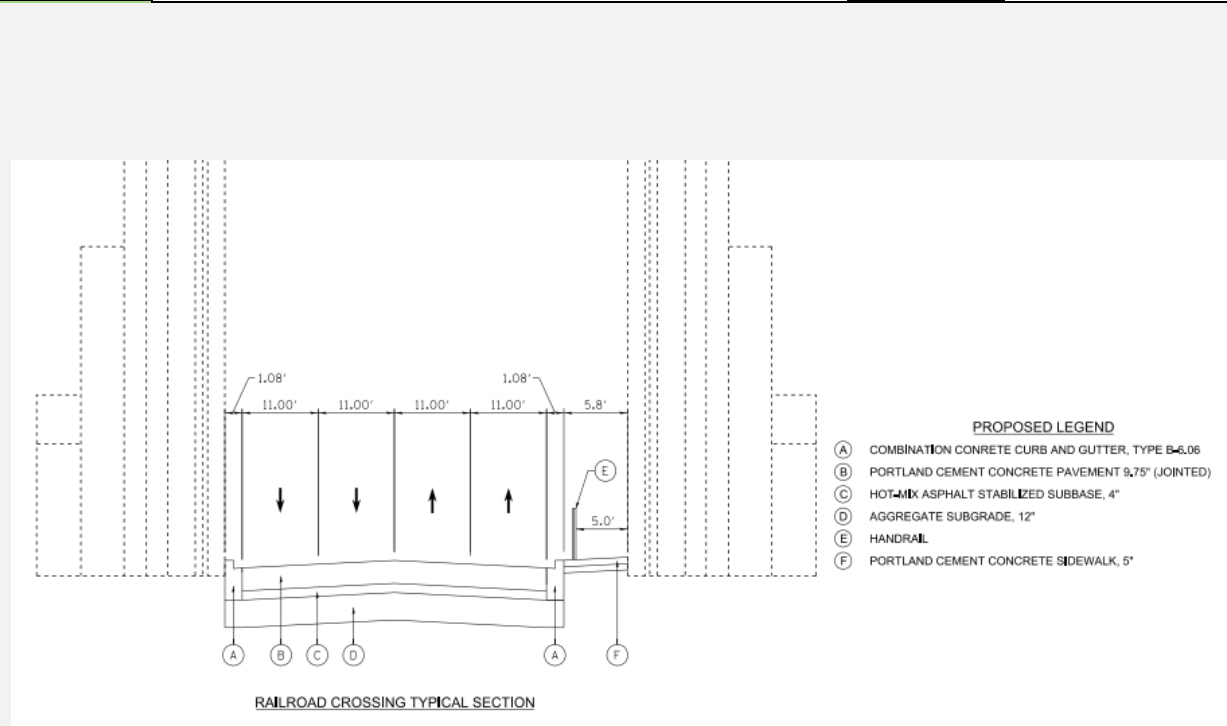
Proposed roadway section at UPRR bridge (N.T.S)
